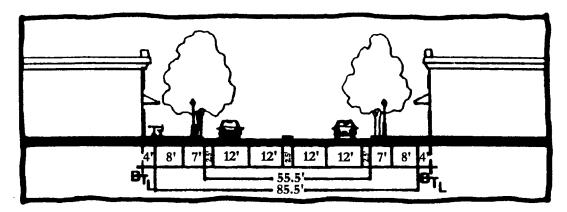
Central Square Cross section: A Village Center Option Commercial/mixed use, four lanes (12' each), median island (2.5'), shoulders (2.5'), sidewalk (8') and pedestrian lighting and planting strip (7'). The Build To Line, i.e., storefront, would be 4 feet from the sidewalk.
